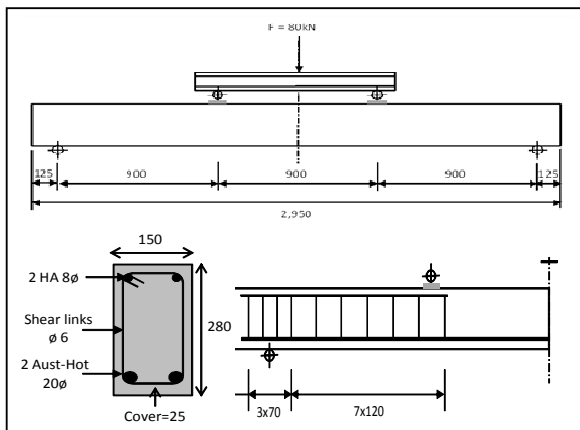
Dimension of the RC beam as per constructed and tested in laboratory
